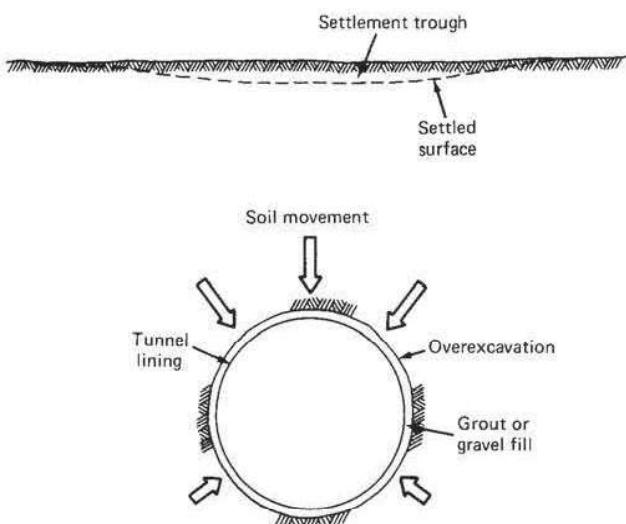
Behavior of a soft ground tunnel. Note that soil also tends to move toward the face of the tunnel.
